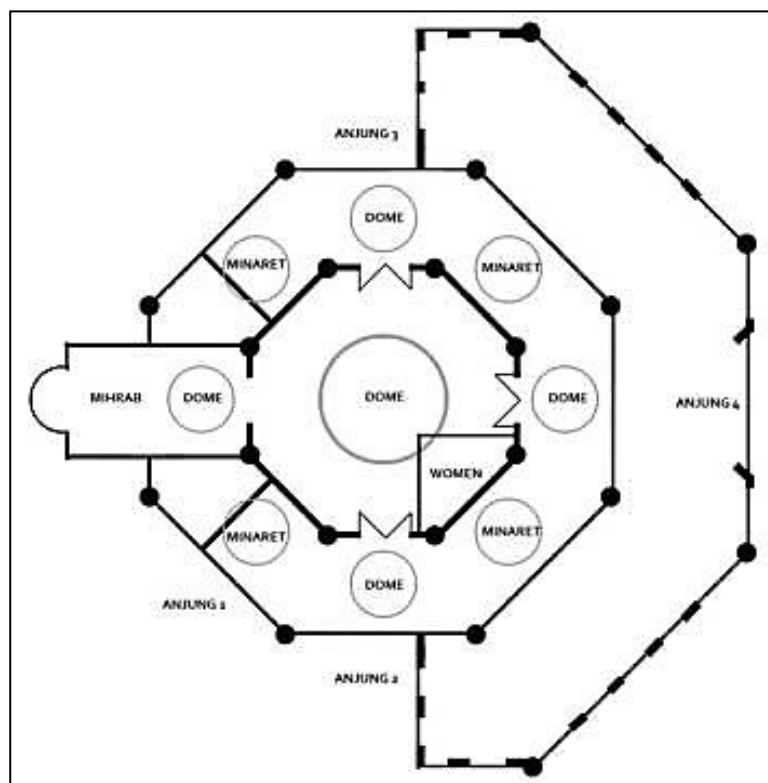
Masjid Ubudiah octagonal floor plan structural layout
